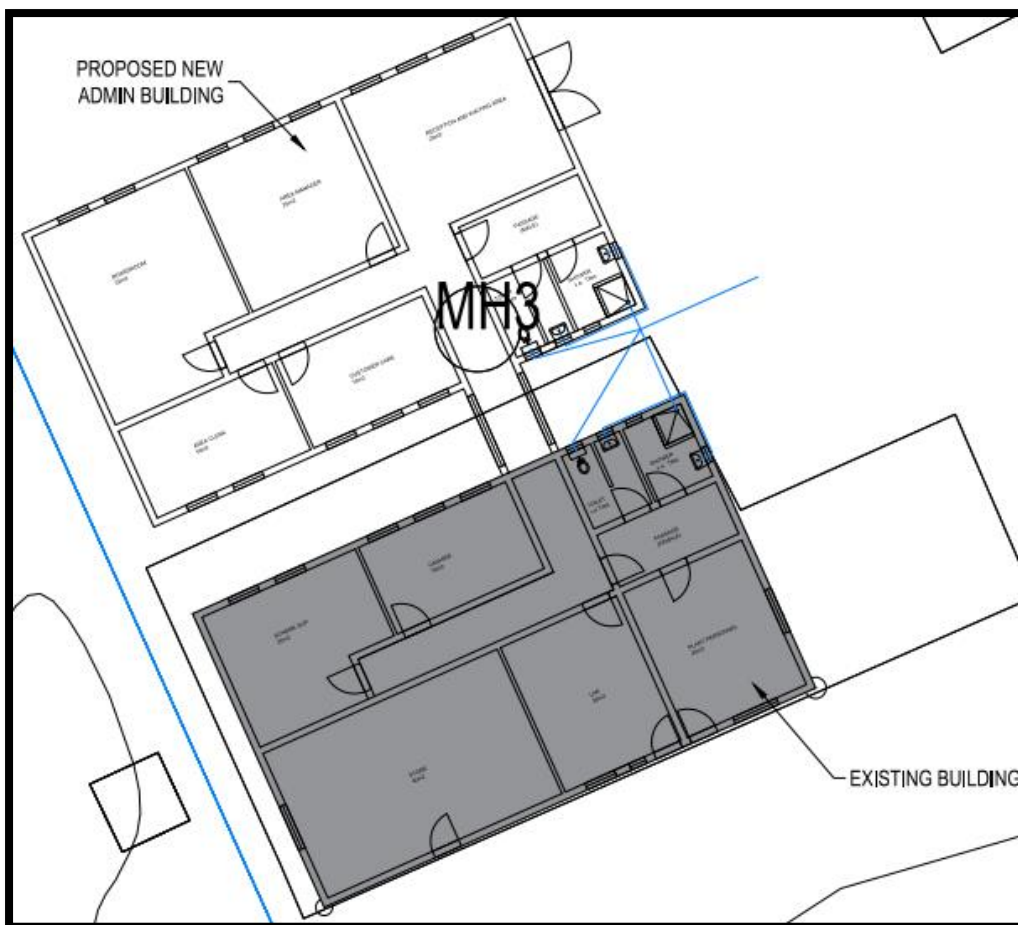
Proposed administration building (Source: Element Consulting Engineers, 2020)
